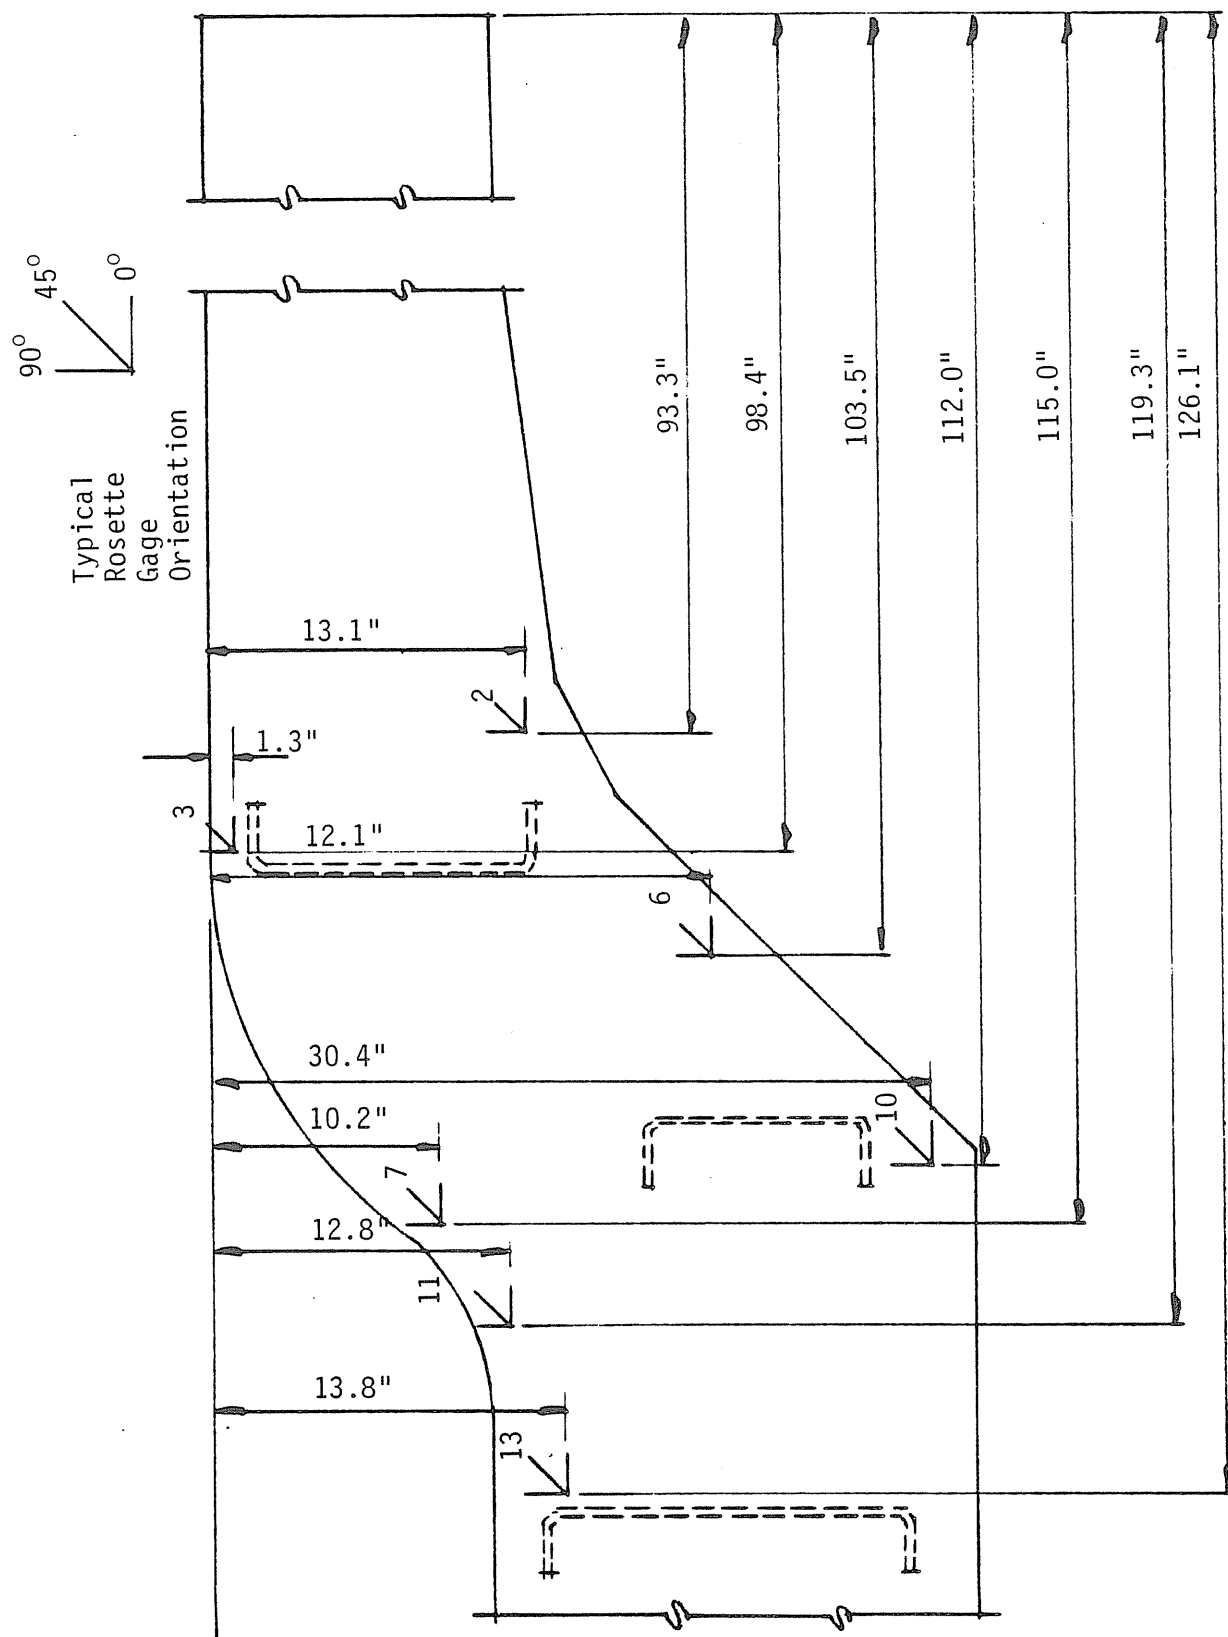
Location of Strain Gages on Outside of Beam Web
